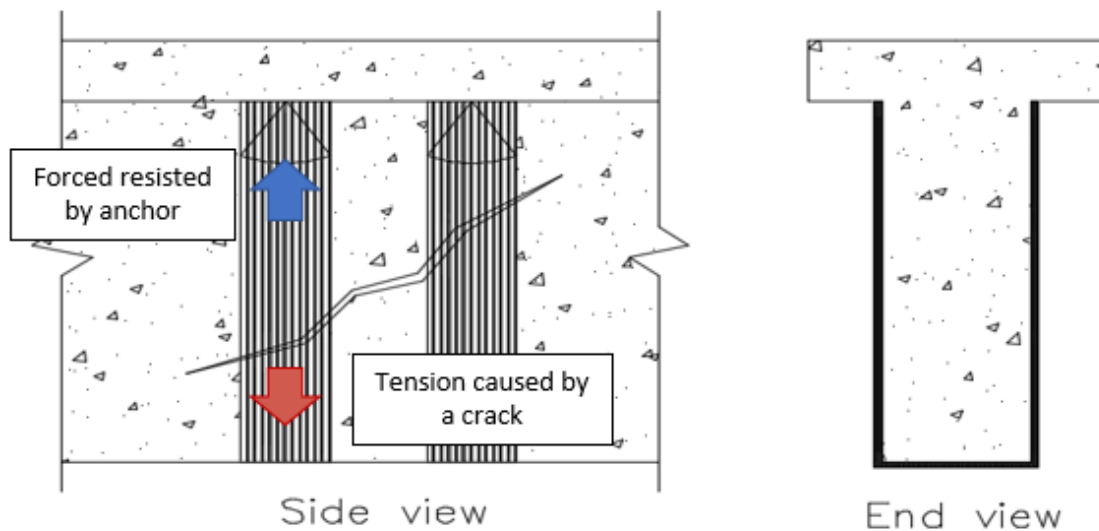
CFRP system loading in a shear strengthened concrete beam with inclined cracking
